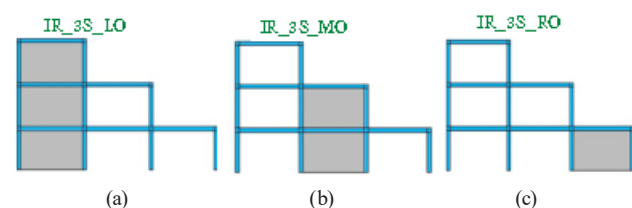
The irregular 3-story reinforced concrete structure with a shear wall in the (a) left, (b) middle and (c) right openings
